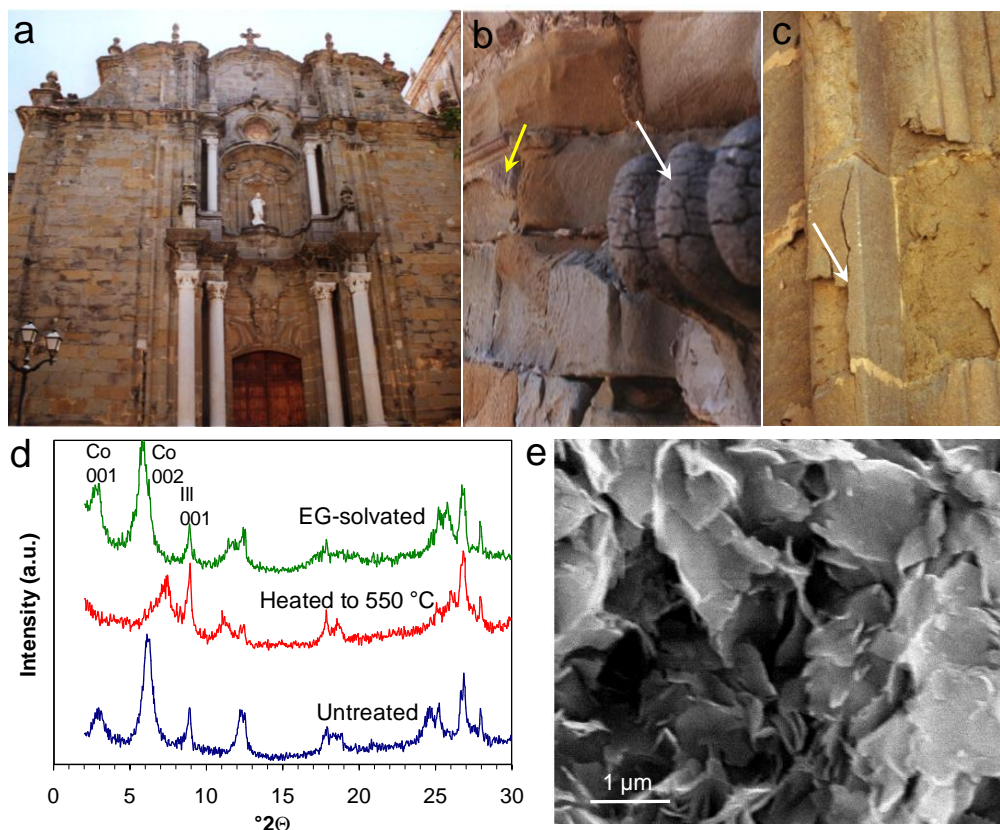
Clay swelling damage at the Church of San Mateo in Tarifa (Spain). a) Overview of the main façade of the church, showing extensive damage (scaling, delamination, contour scaling and drying cracks); b) detail of drying cracks, also known as "mud cracks" (white arrow) and scaling (yellow arrow) of the stone blocks and surface reliefs; c) detail of contour scaling (arrow); d) XRD patterns (Cu K α radiation) of oriented aggregates of the clay fraction (~5 wt%) of Tarifa sandstone showing Bragg peaks of Corrensite (Co), a regular mixed layer smectite-chlorite (i.e., a swelling clay), and non-swelling Illite (III). The d_{001} -spacing of Corrensite expands upon EG solvation from 28 up to 32 Å and collapses to 12 Å upon heat treatment, confirming the presence of such a regular mixed layer clay (Moore and Reynolds, 1989); e) SEM image of the swelling clays within Tarifa sandstone. Modified from Sebastian et al. (2008).
